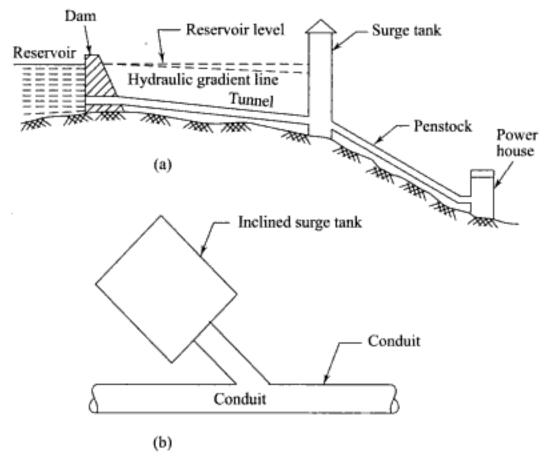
(a) Surge tank on ground level, (b) Inclined surge tank
